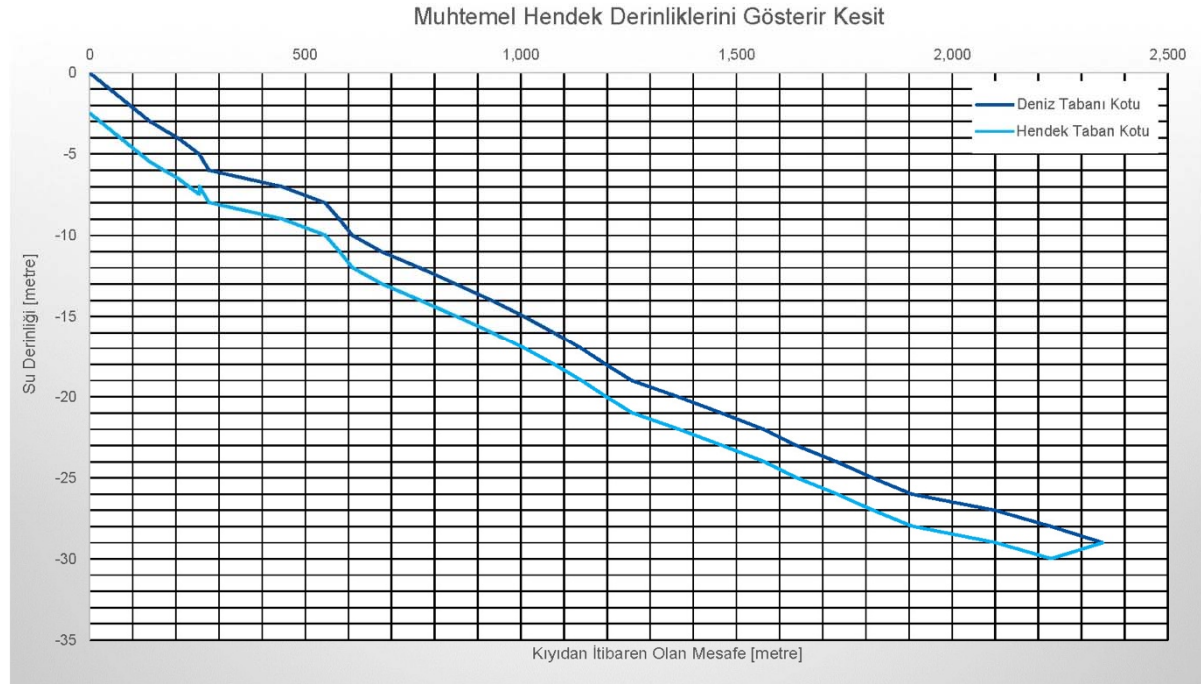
Section Showing Presumptive Trench Depth (Shore Crossing Section)
